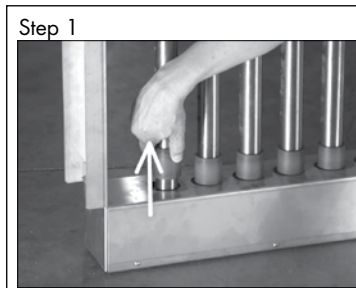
DISPERSION TUBE SLIP COUPLINGS
